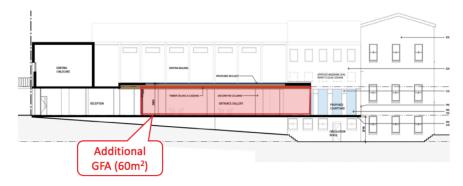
Extract of the Proposed Long Section (Source: Drawing DA\_201\_A prepared by Leaf Architecture), with the location of the new GFA marked in red
